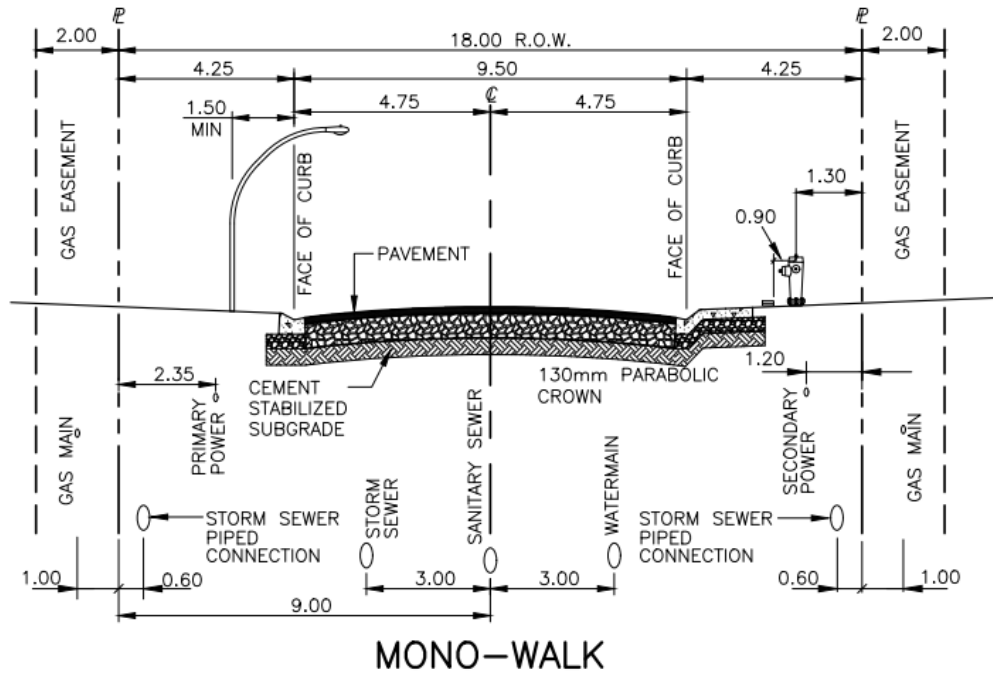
Mono-walk local road cross section, Spruce Grove Engineering Standards
